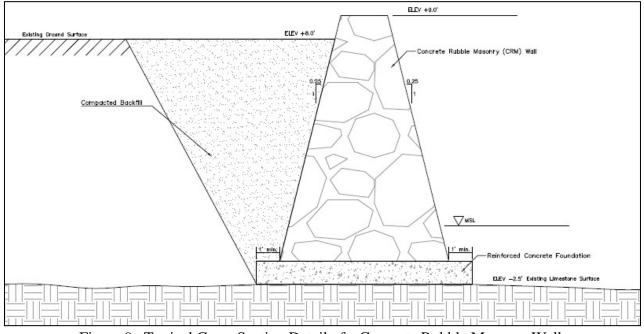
Typical Cross Section Detail of a Concrete Rubble Masonry Wall
